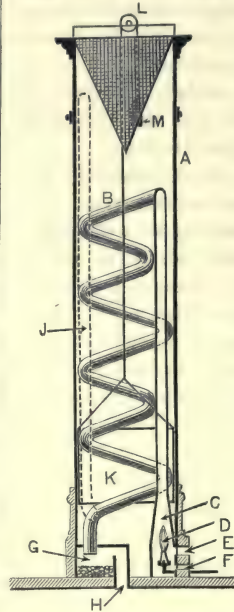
Air Inlet Tube fitted with Fresh Air Warming Arrangement (Boyle).
